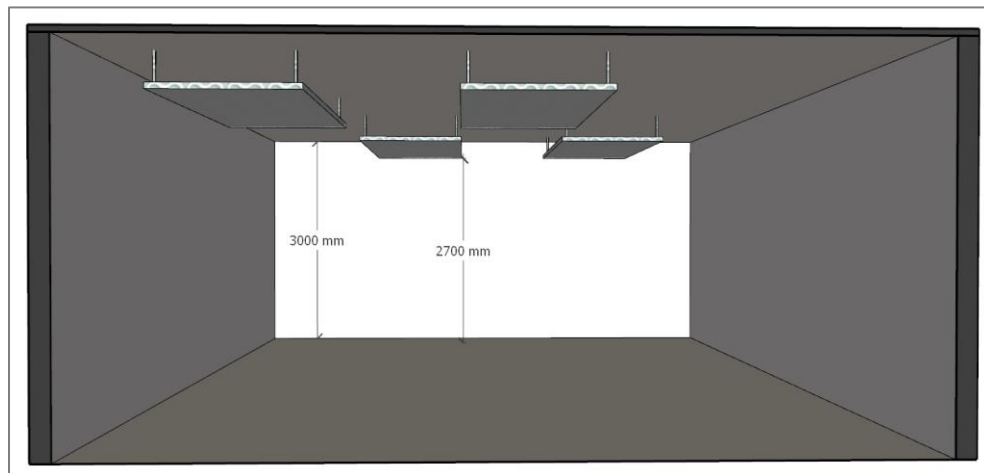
Illustration of proposed floating ceiling panels (author's illustration).
